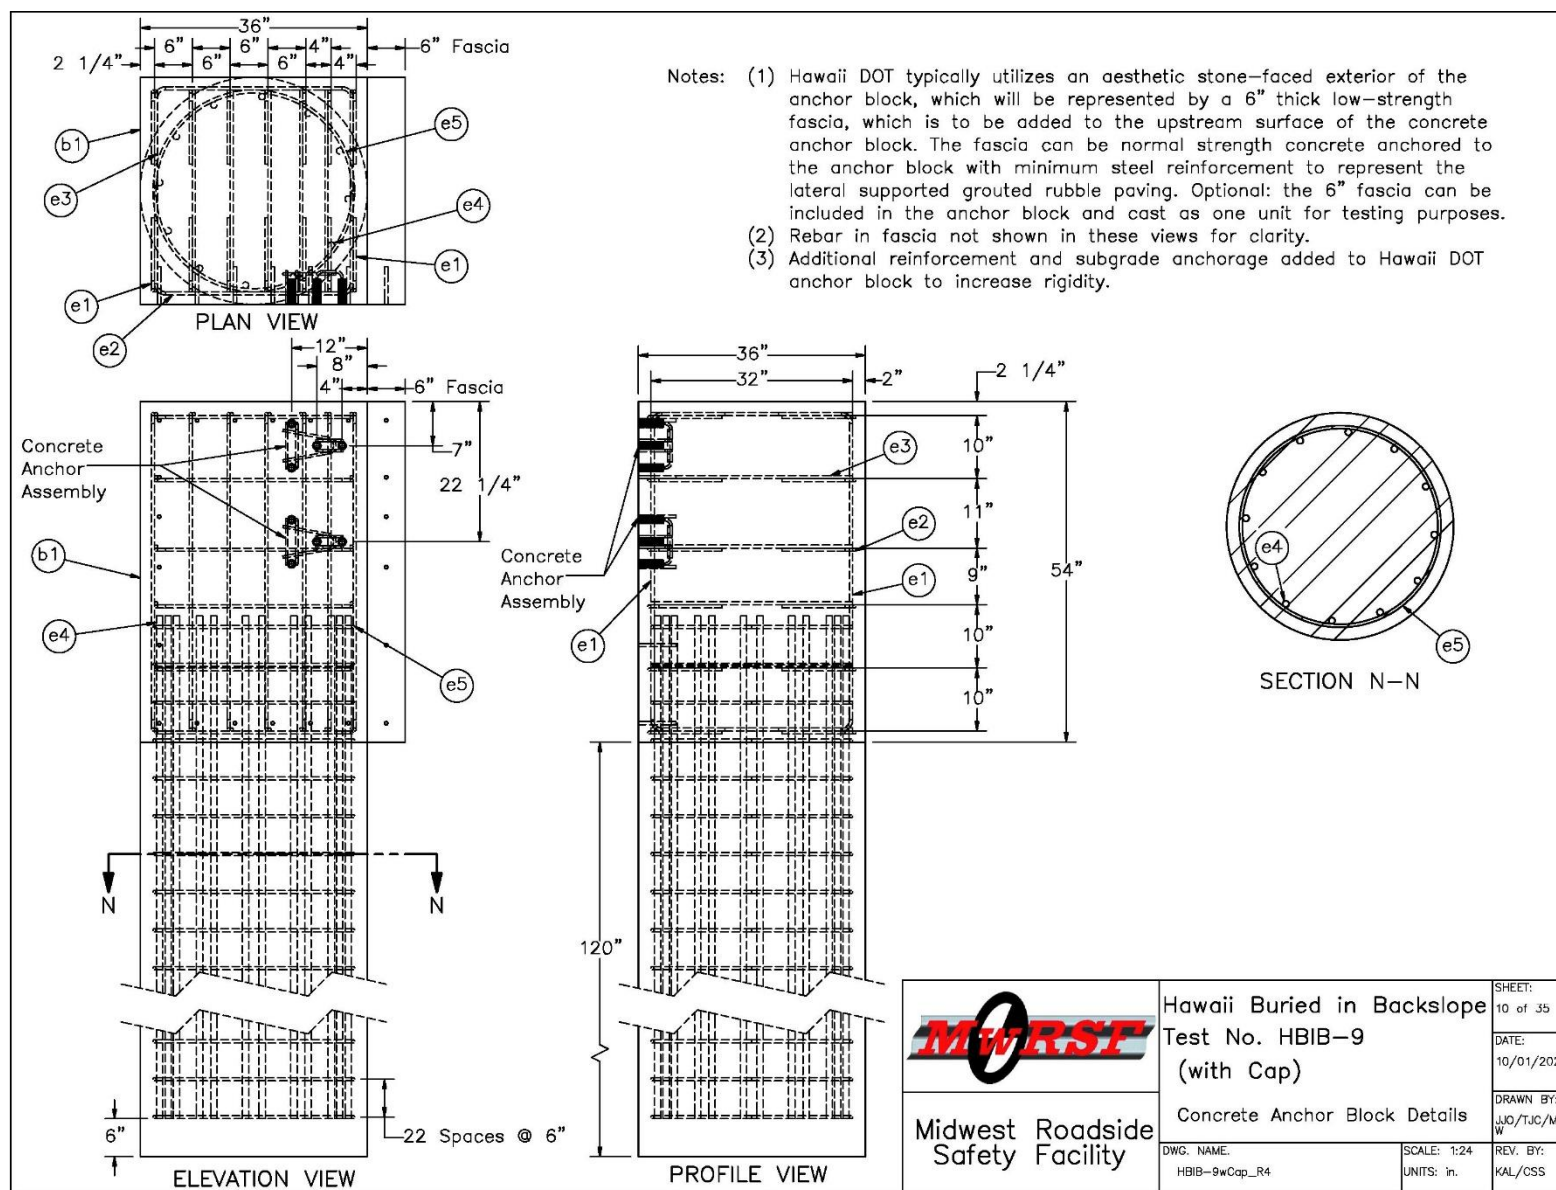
Concrete Anchor Block Details, Test No. HBIB-9
